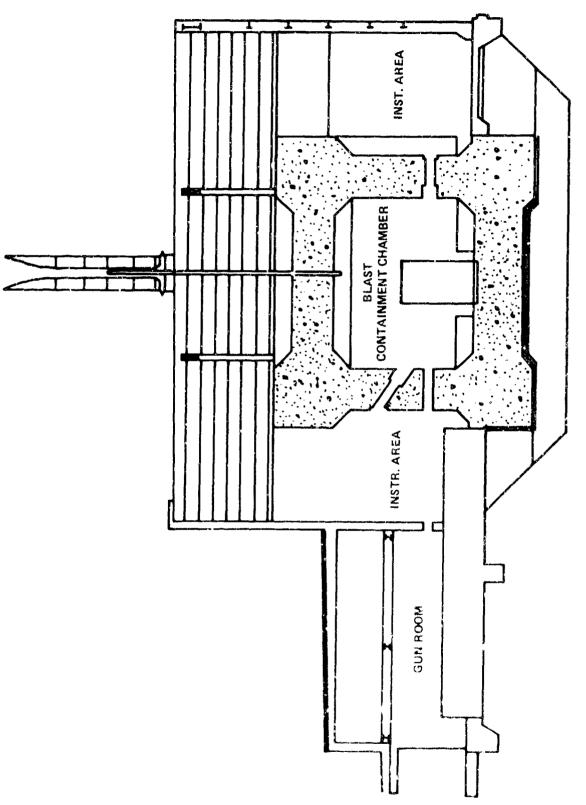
BUILDING 327, SIDE VIEW, EAST
